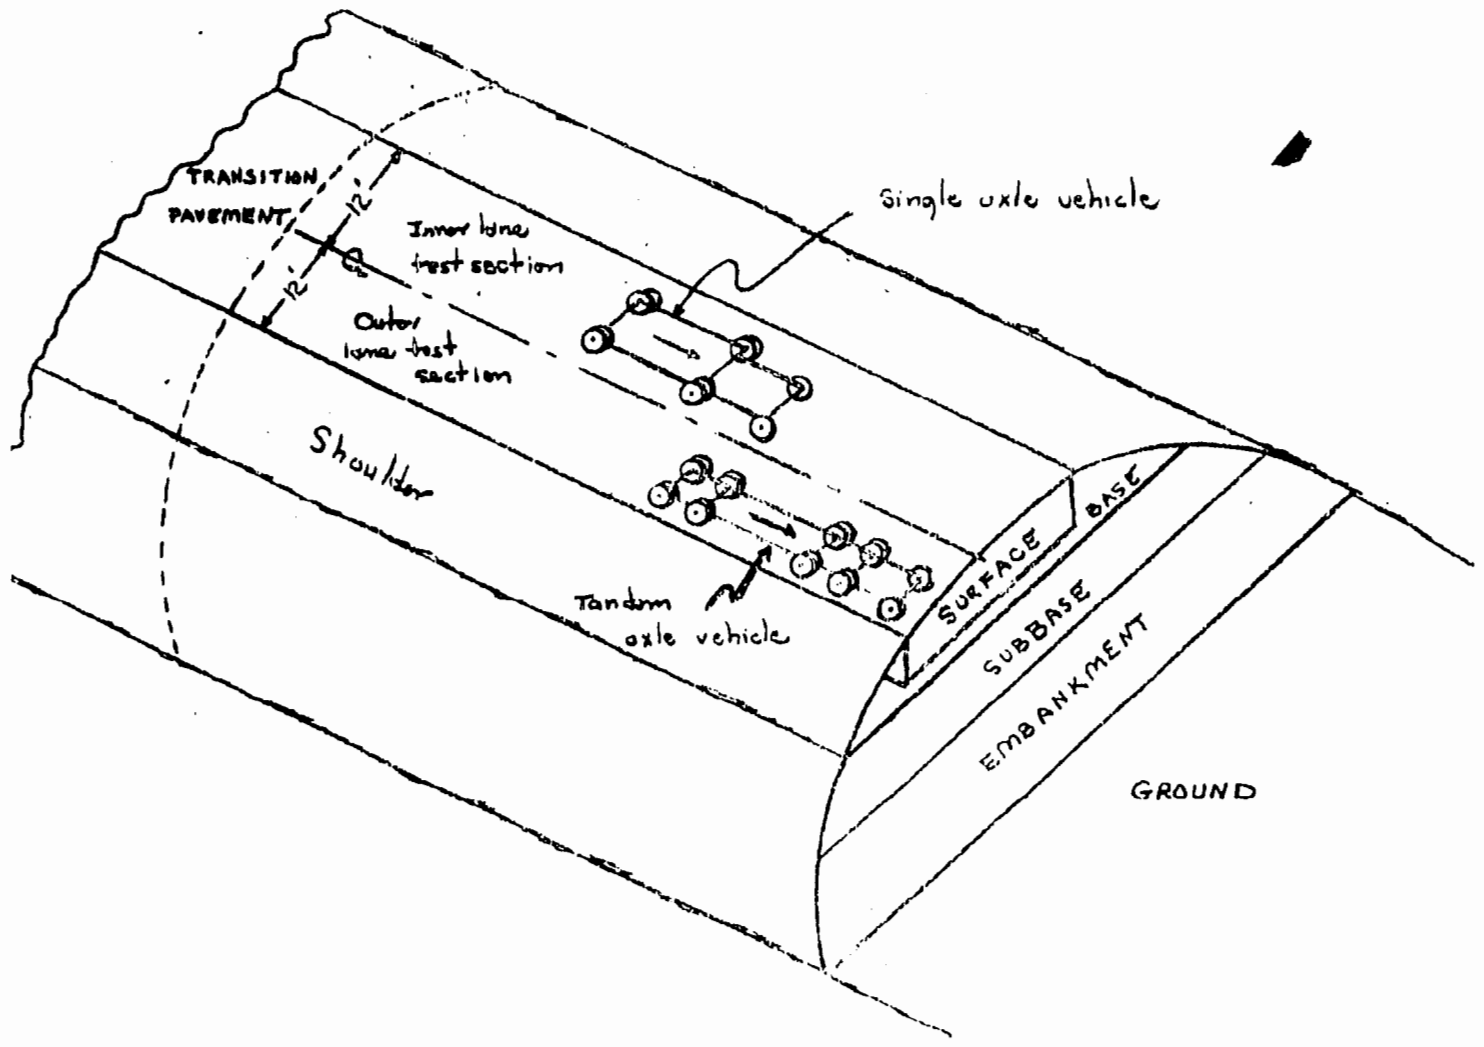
SCHEMATIC LOADED STRUCTURAL SECTION
